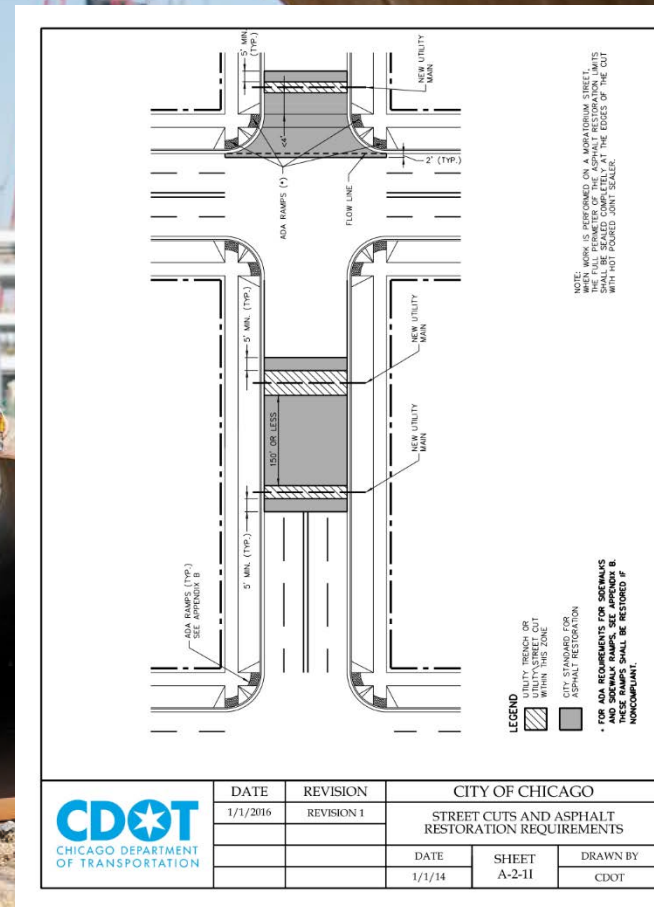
CDOT Detail A-2-11 Street Cuts and Asphalt Restoration Requirements
